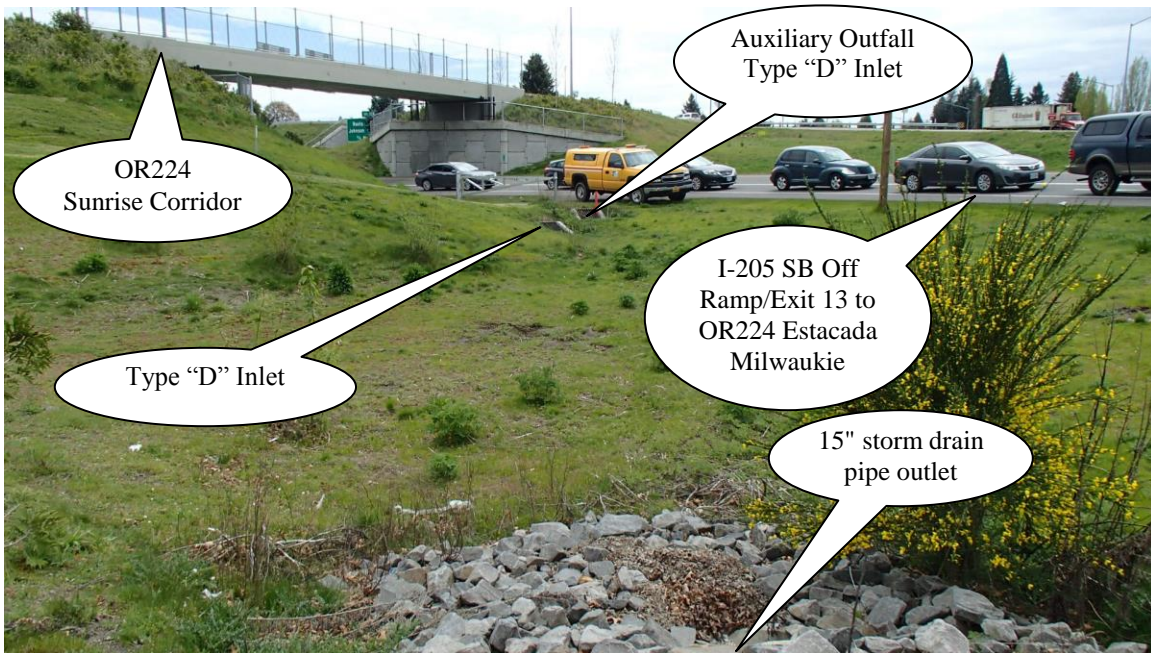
a view of bio-retention pond, looking South toward I-205 off ramp.
